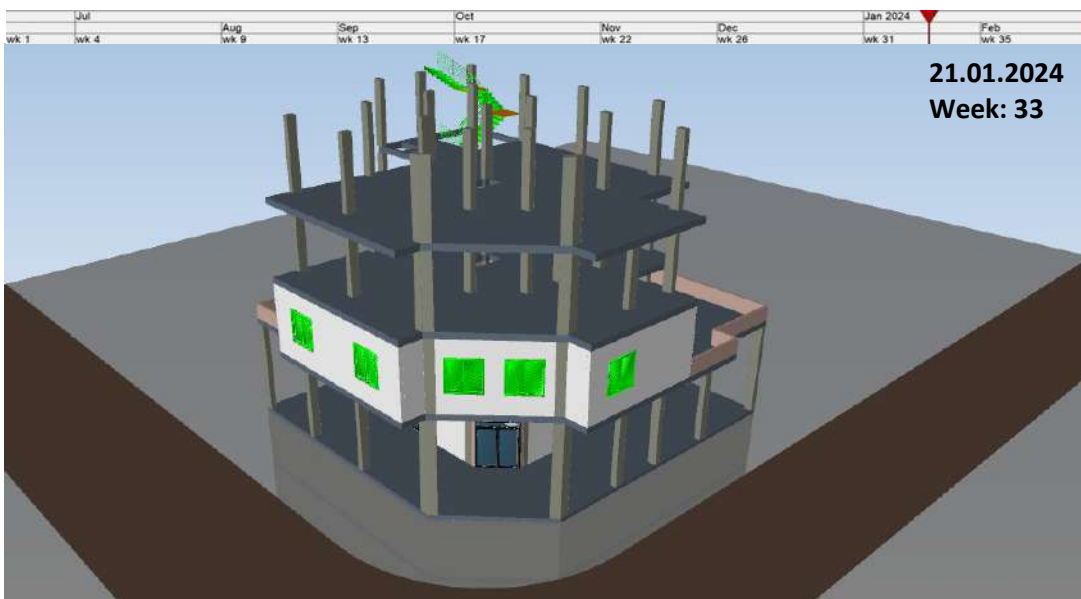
structural work for the 3rd floor and finishes for the 1st floor
